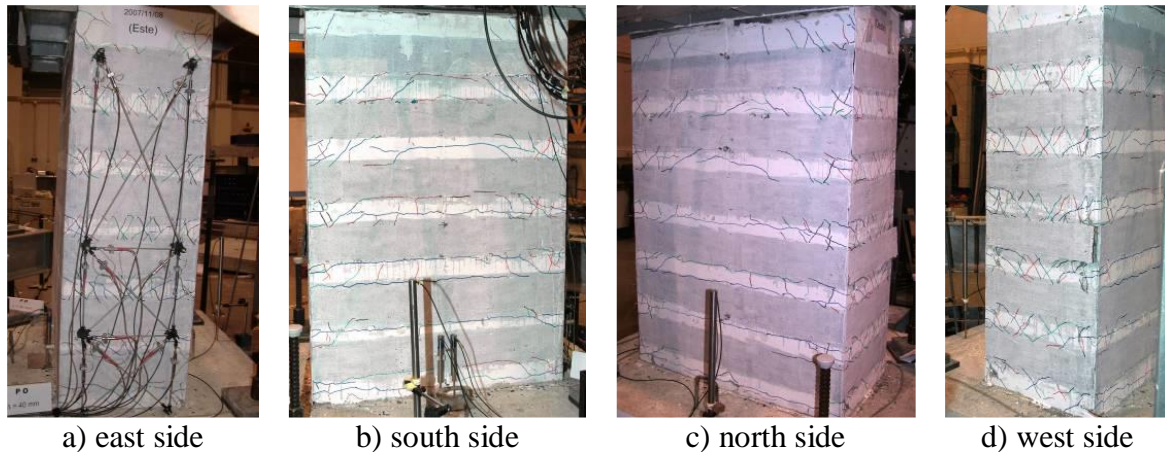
Final damage of pier PO2-N5-R1, for 2,5% drift.
